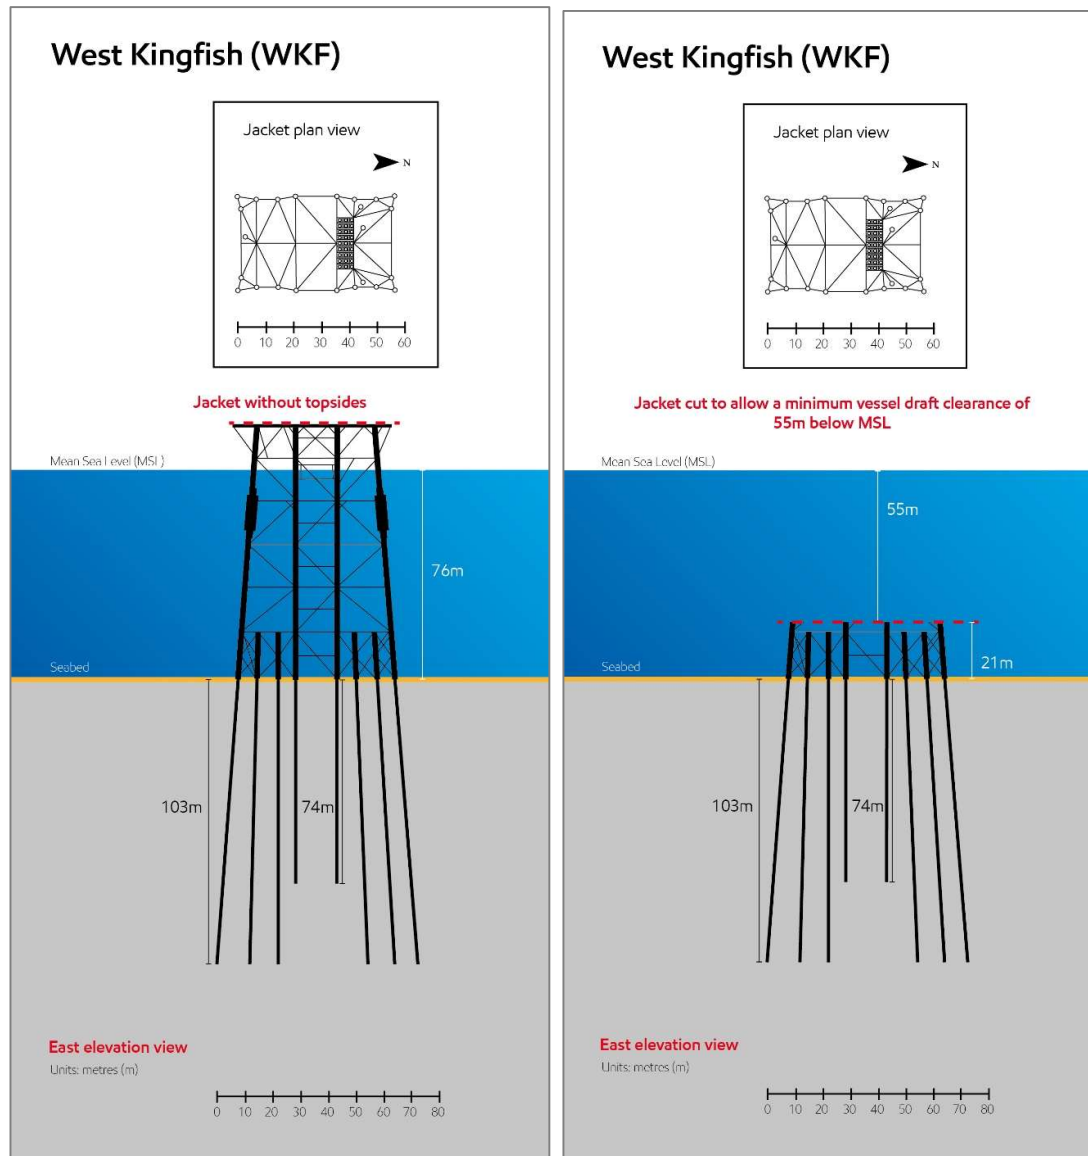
West Kingfish Steel Piled Jacket without topsides (left) and under proposed end state (right)
